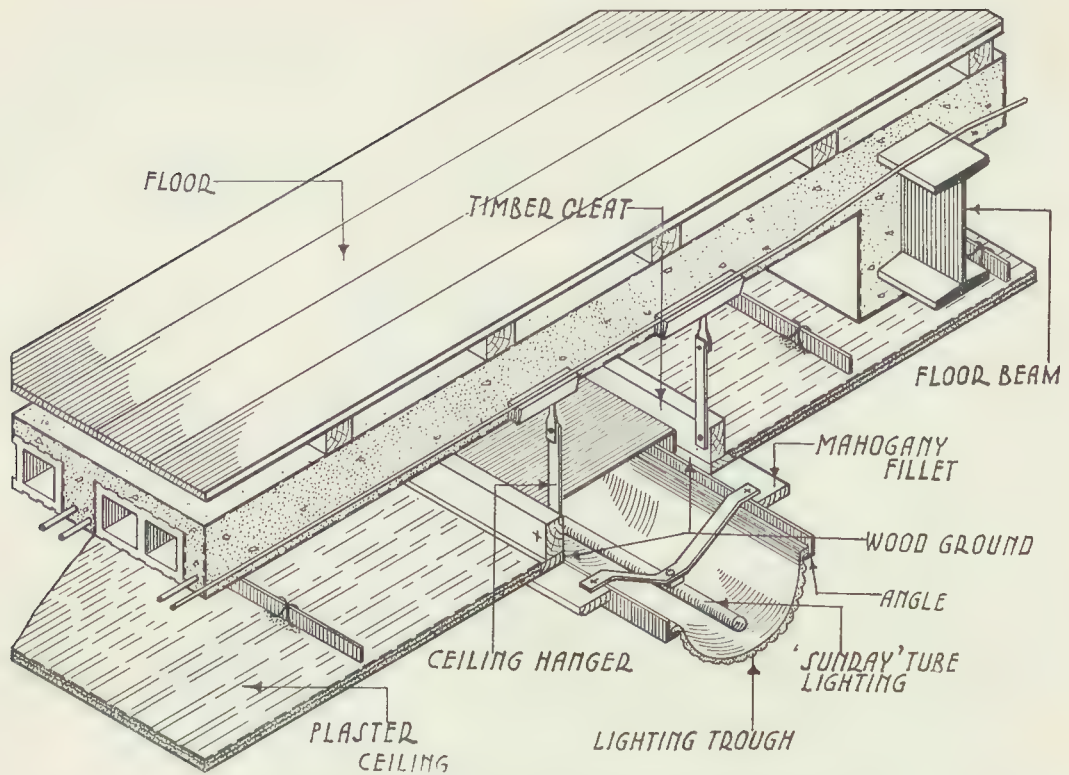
DETAIL THROUGH BENT GLASS TROUGH CEILING LIGHT
